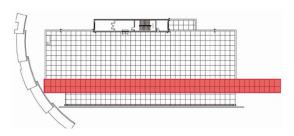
Installation area Of fixed- type roof skylight interior blinds
